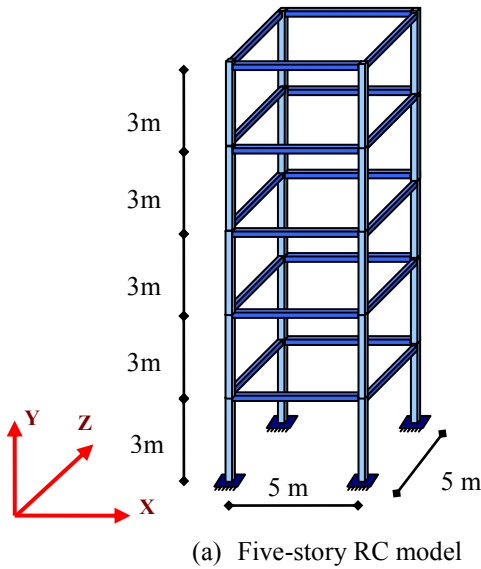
Five-story reinforced concrete (RC) model illustrating beam and column sections and material properties.
